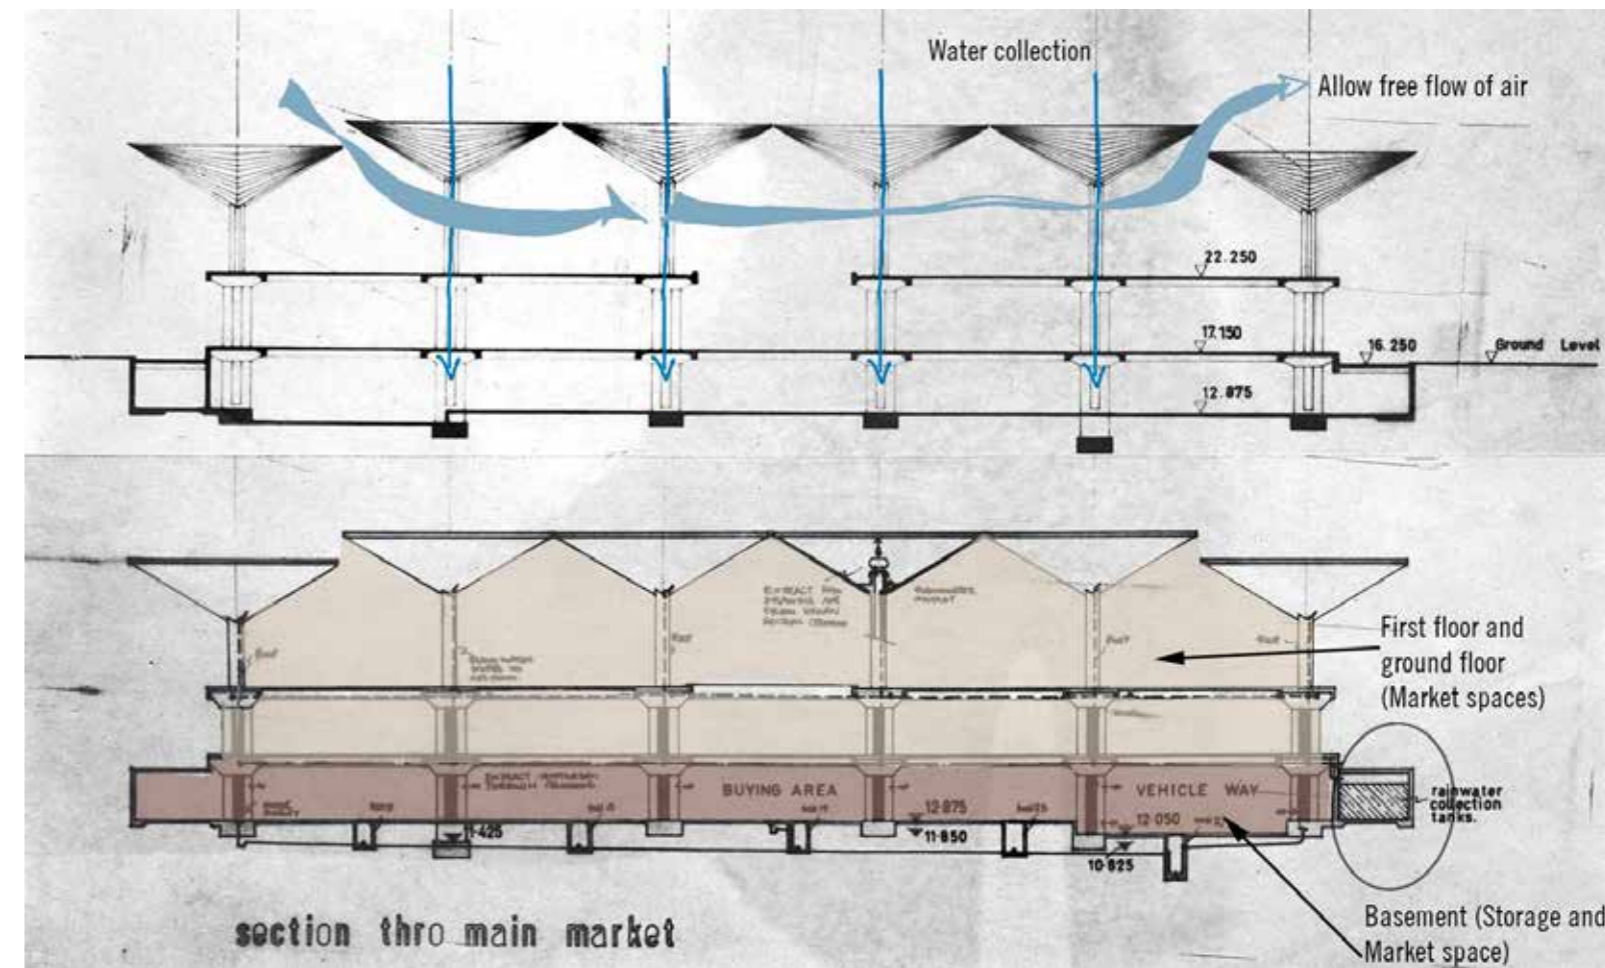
Tree trunk -like or funnel-like concrete structure used for water harvesting (Amani, 2022).
